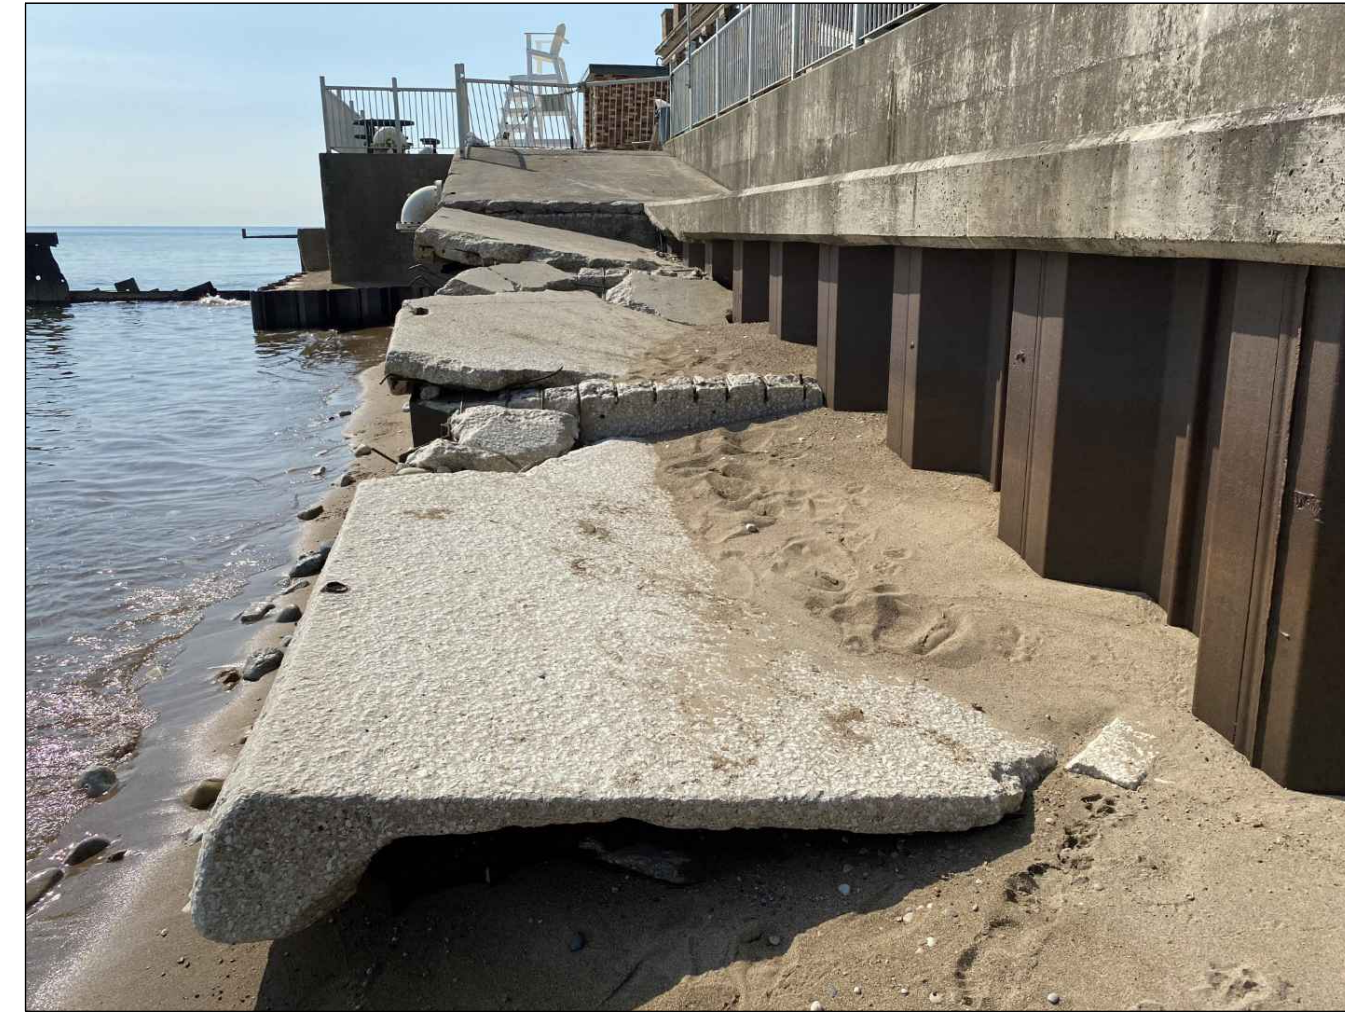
LOOKING SOUTHEAST AT DILAPIDATED CONCRETE RAMP.
